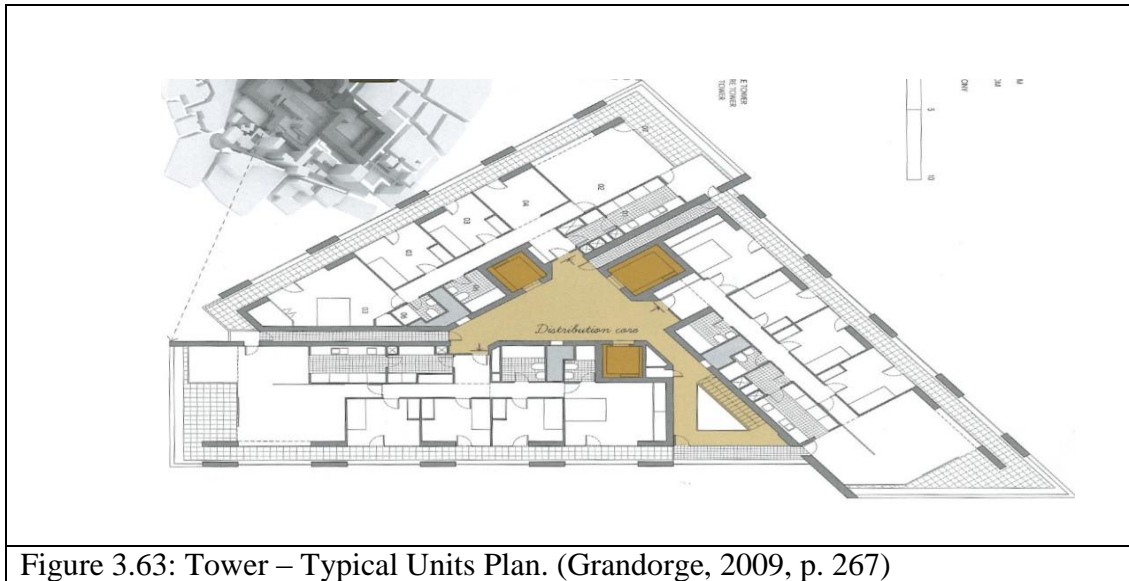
Tower – Typical Units Plan. (Grandorge, 2009, p. 267)
